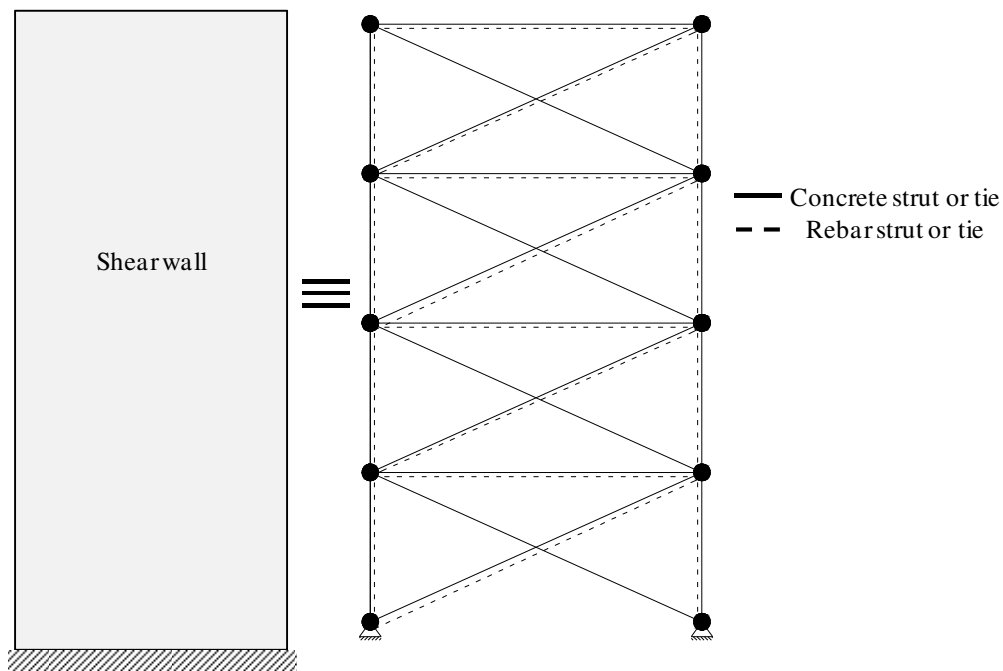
Strut and tie representation assumed for a reinforced concrete shear wall
